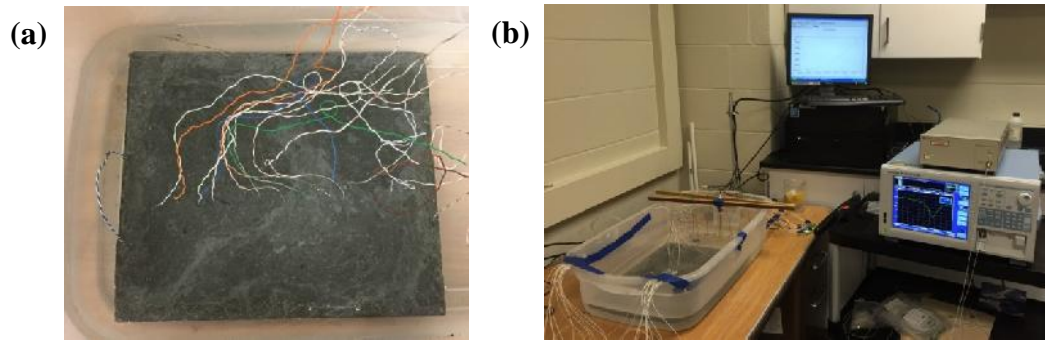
Concrete slab and corrosion test setup.
